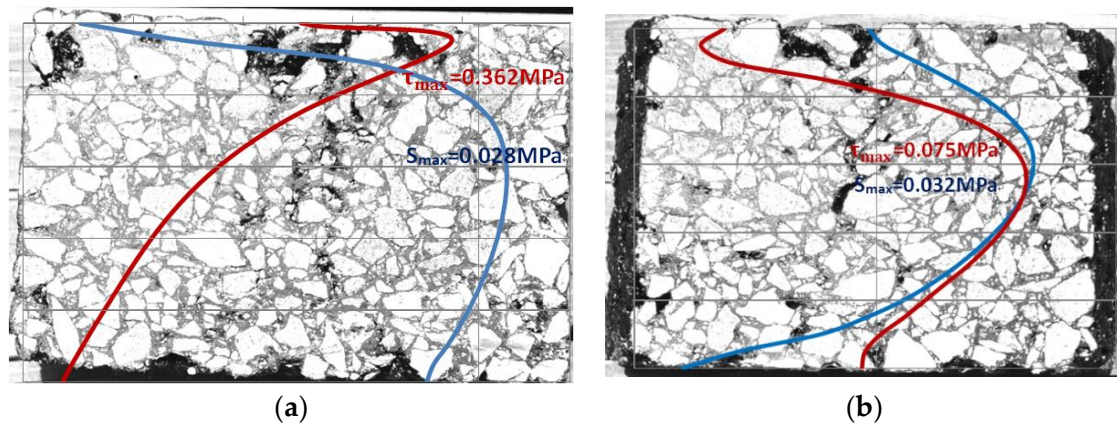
Cracks and stress distribution on cross-sections A and B. (a) Cross-section A; (b) cross-section B.
